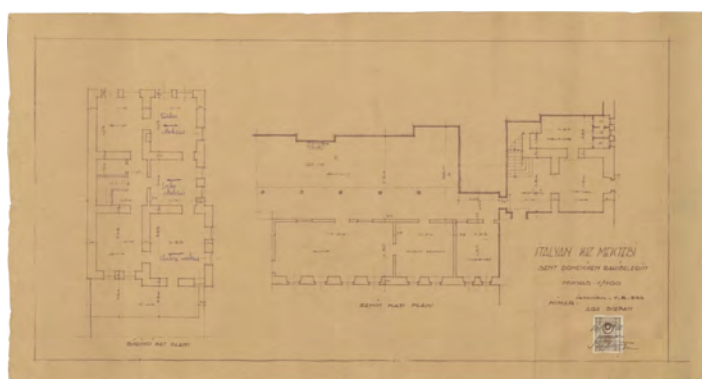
Architect Ara Stepan’s plan drawing of 1932, the Italian girls’ school adapted from the old monastery building.
